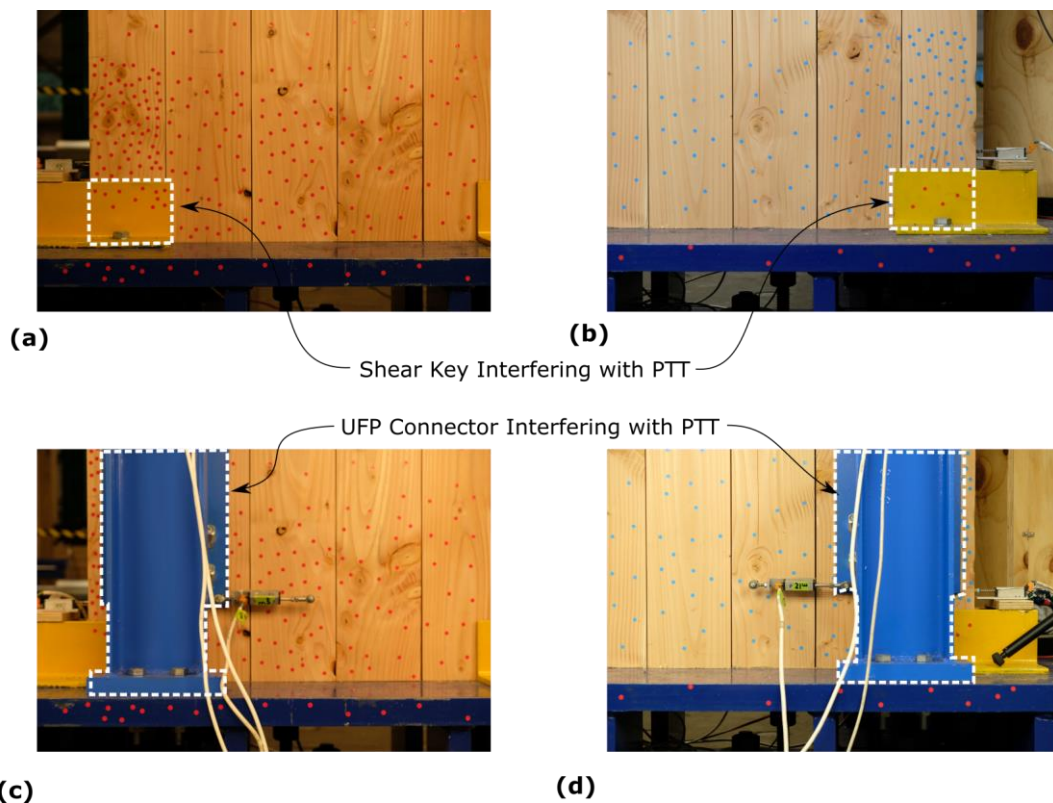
PTT and interference by shear key and UFP connector: (a) and (c) Wall 1 base, (b) and (d) Wall 2 base
